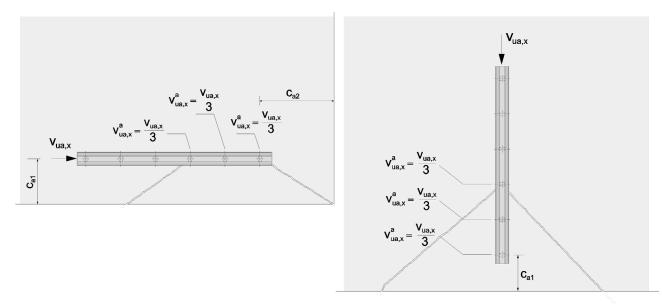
EXAMPLE FOR THE CALCULATION OF ANCHOR FORCES IN CASE OF ANCHOR CHANNELS WITH 6 ANCHORS LOADED IN SHEAR LONGITUDINAL TO THE CHANNEL AXIS FOR CONCRETE EDGE FAILURE 4.1.5 Forces related to anchor reinforcement: If tension loads are acting on the anchor channel, the factored tension forces of the anchor reinforcement for one anchor shall be computed for the factored tension load, $N^{a}_{ua,i}$, of the anchor assuming a strut-and-tie model.
